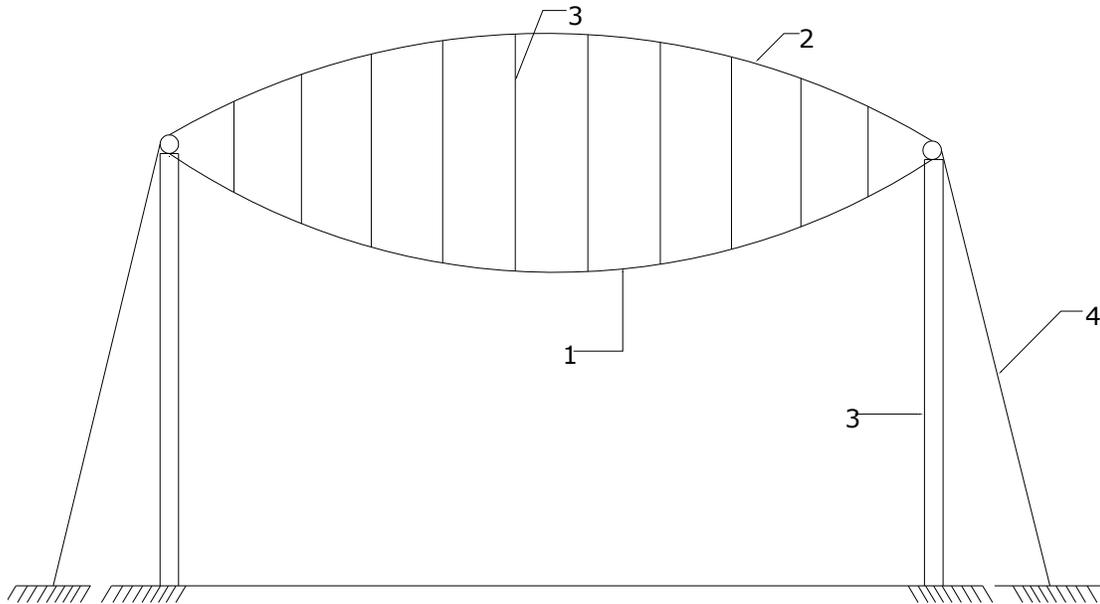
Double layer cable-convex shape for rectangular buildings
